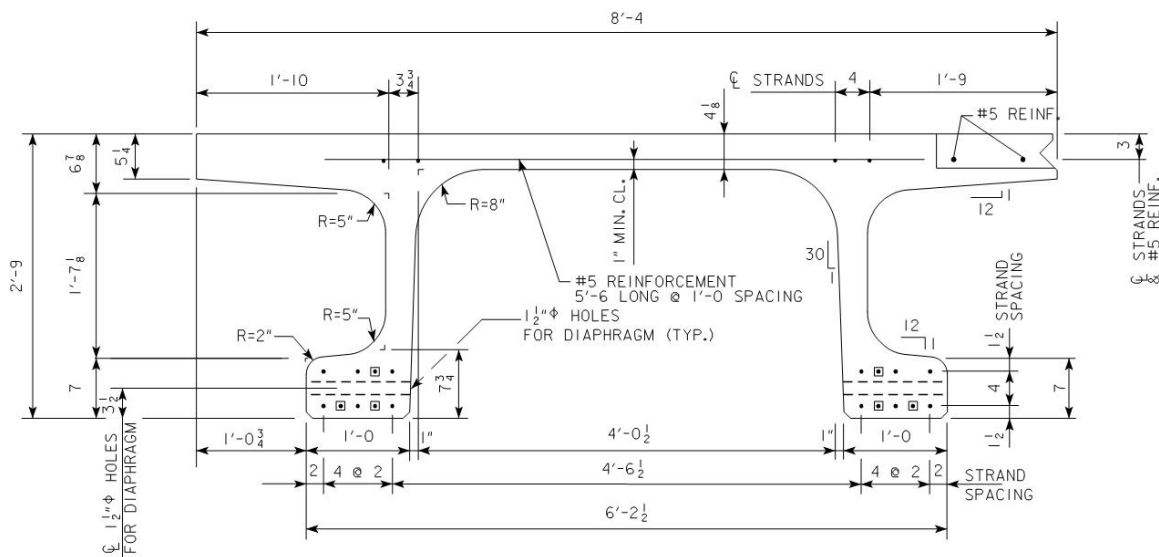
Typical cross section of the Pi girder as designed for the Buchanan County Bridge.
